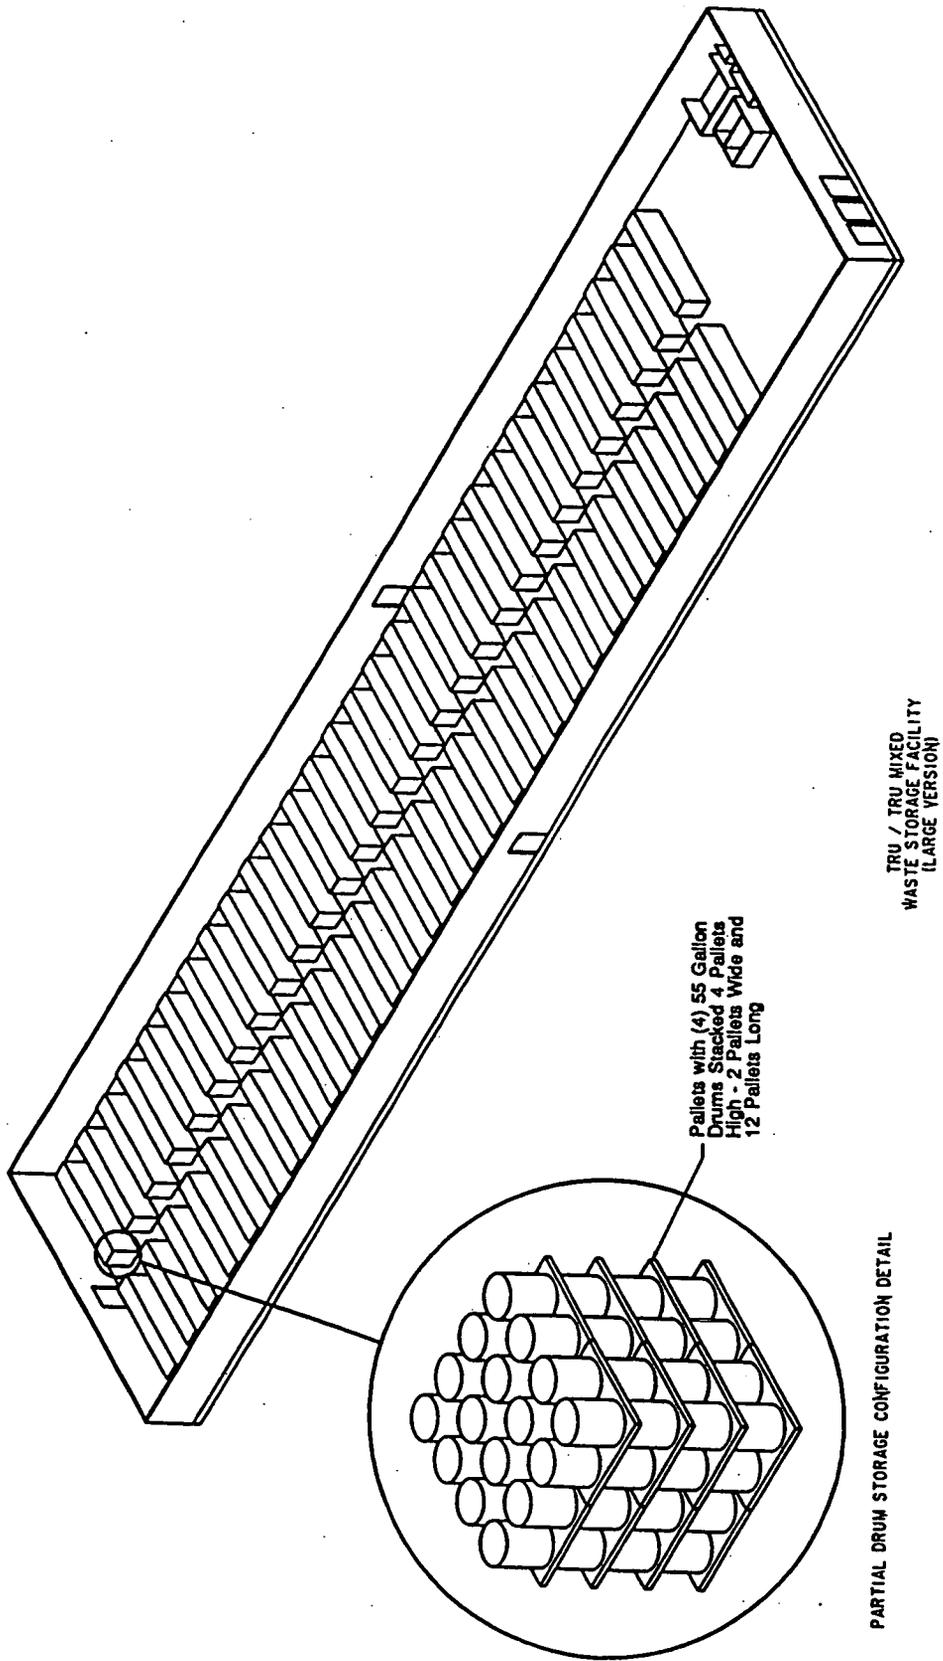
Conceptual Layout of New TRU/TRM Waste Storage Facility (Exploded View)
